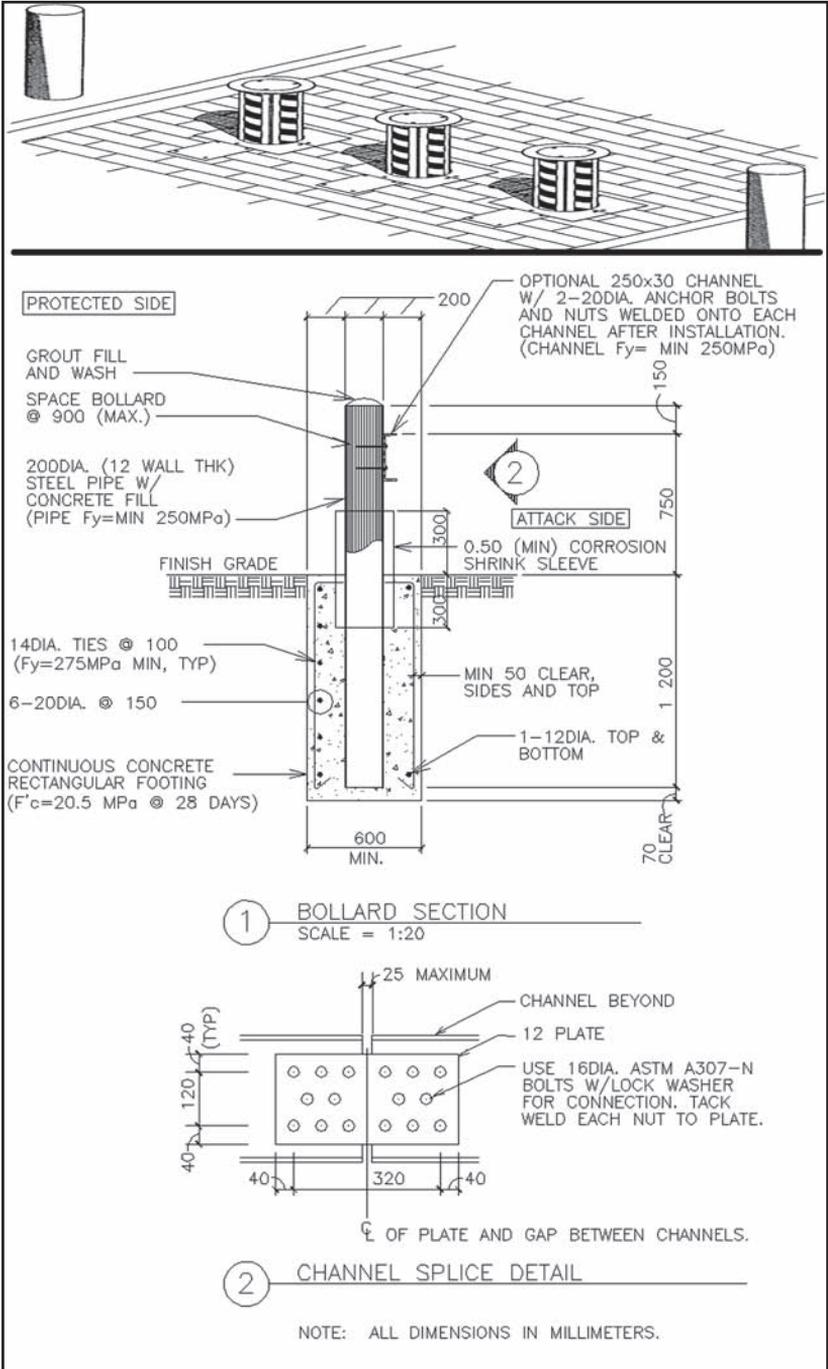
Typical Bollard Construction Detail (Above: Retractable bollards; Below: Fixed bollard construction detail) (UFC 4-022-02)
